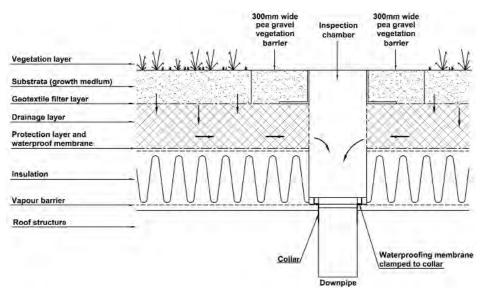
Example detail of outlet from a green roof (adapted from Wilson et al, 2004)
